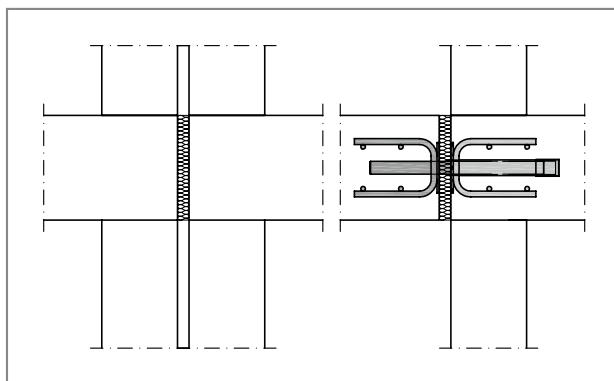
Expansion joint using a Schöck Dorn instead of a twin column or double wall
